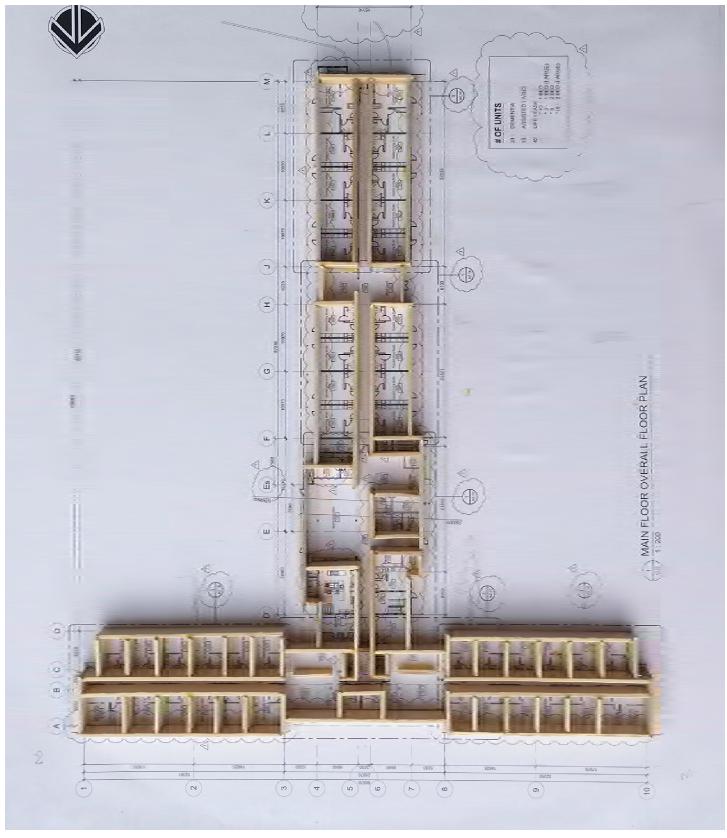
Layout Model of Ground Floor of Wainwright Building
